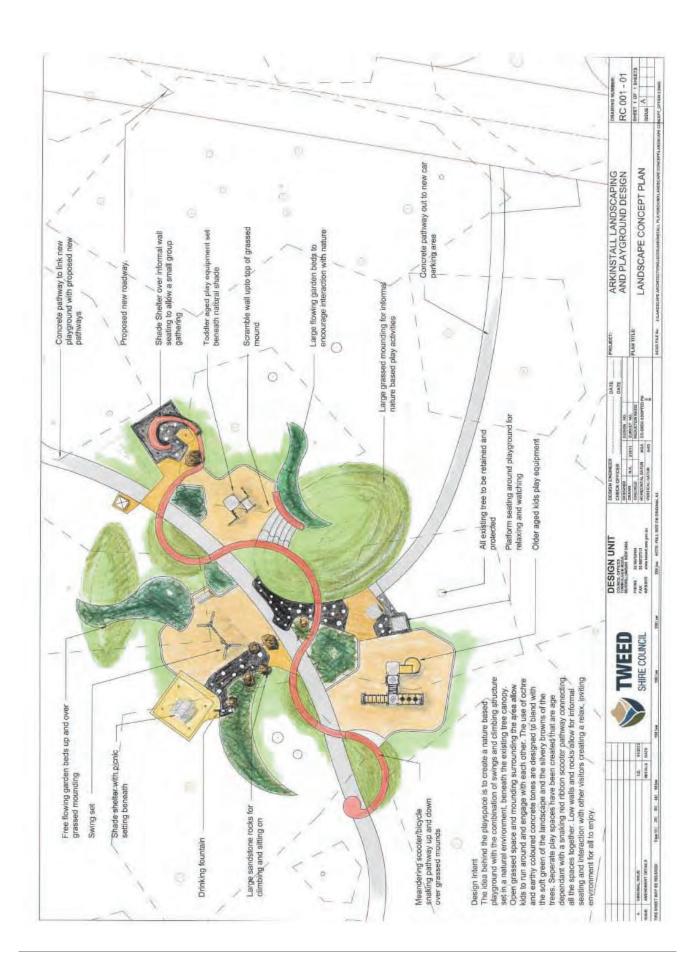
Landscape concept plan for community recreation area in Arkinstall park
